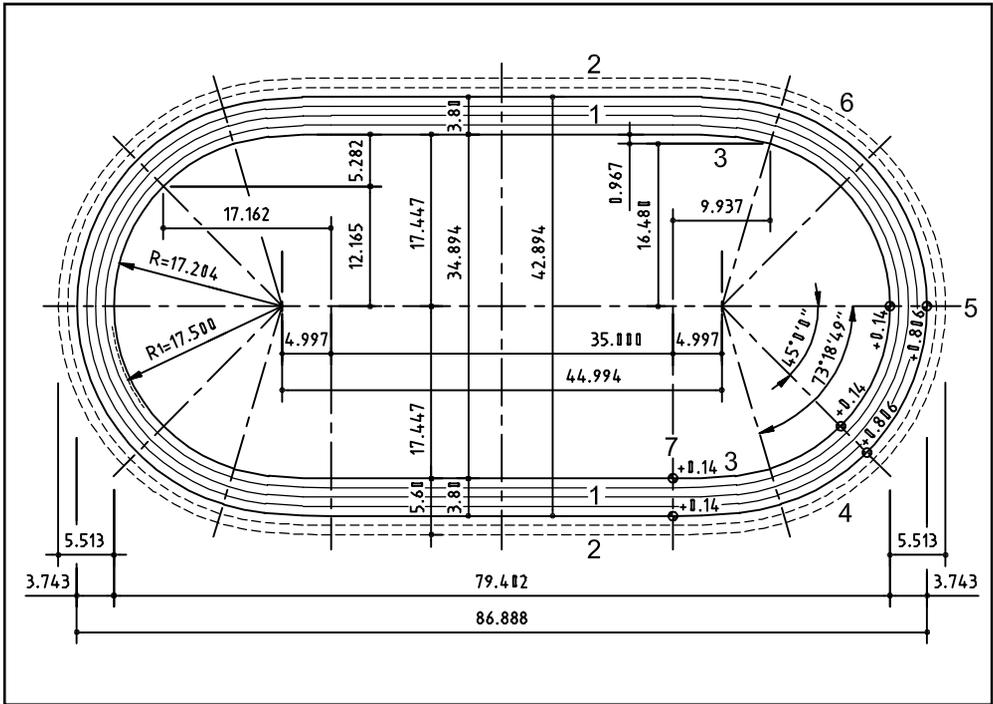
Setting out plan of the 200m Standard Indoor Track
